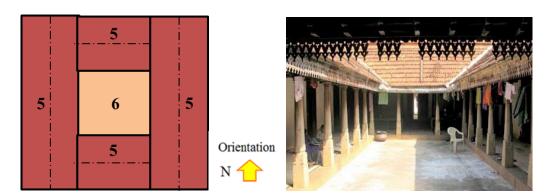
Vardhamana (5 – Main Building, 6 – Court) (Source: www.team-bhp.com)
